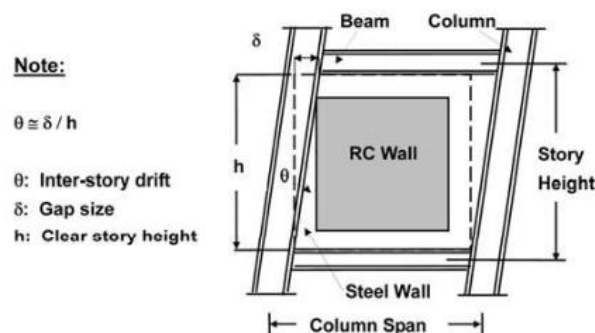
Gap between Reinforced Concrete Infill and Steel Frame, Zhao and Astanceh-Asl (2004)
